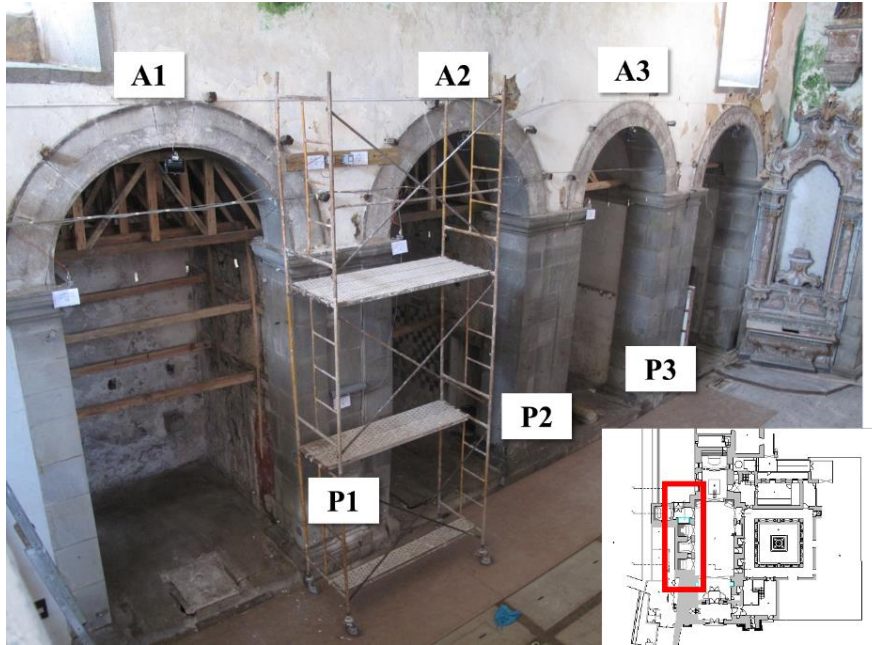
Columns 1, 2 and 3 and arches 1, 2 and 3.
